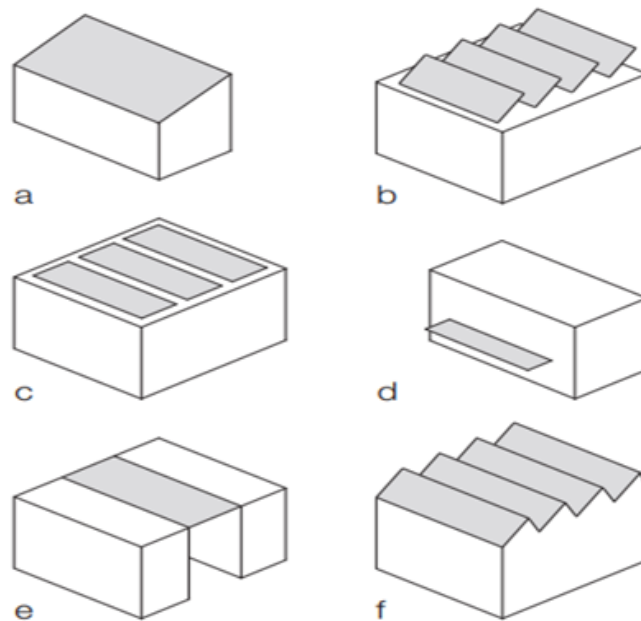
Preferred roof areas for PV applications a) Pitched roof, b) Flat roof, stand-off mounting, c) Flat roof, as roof waterproofing, d) Canopy, e) Atrium roof, f) Sawtooth roof (Weller et al., 2012)
